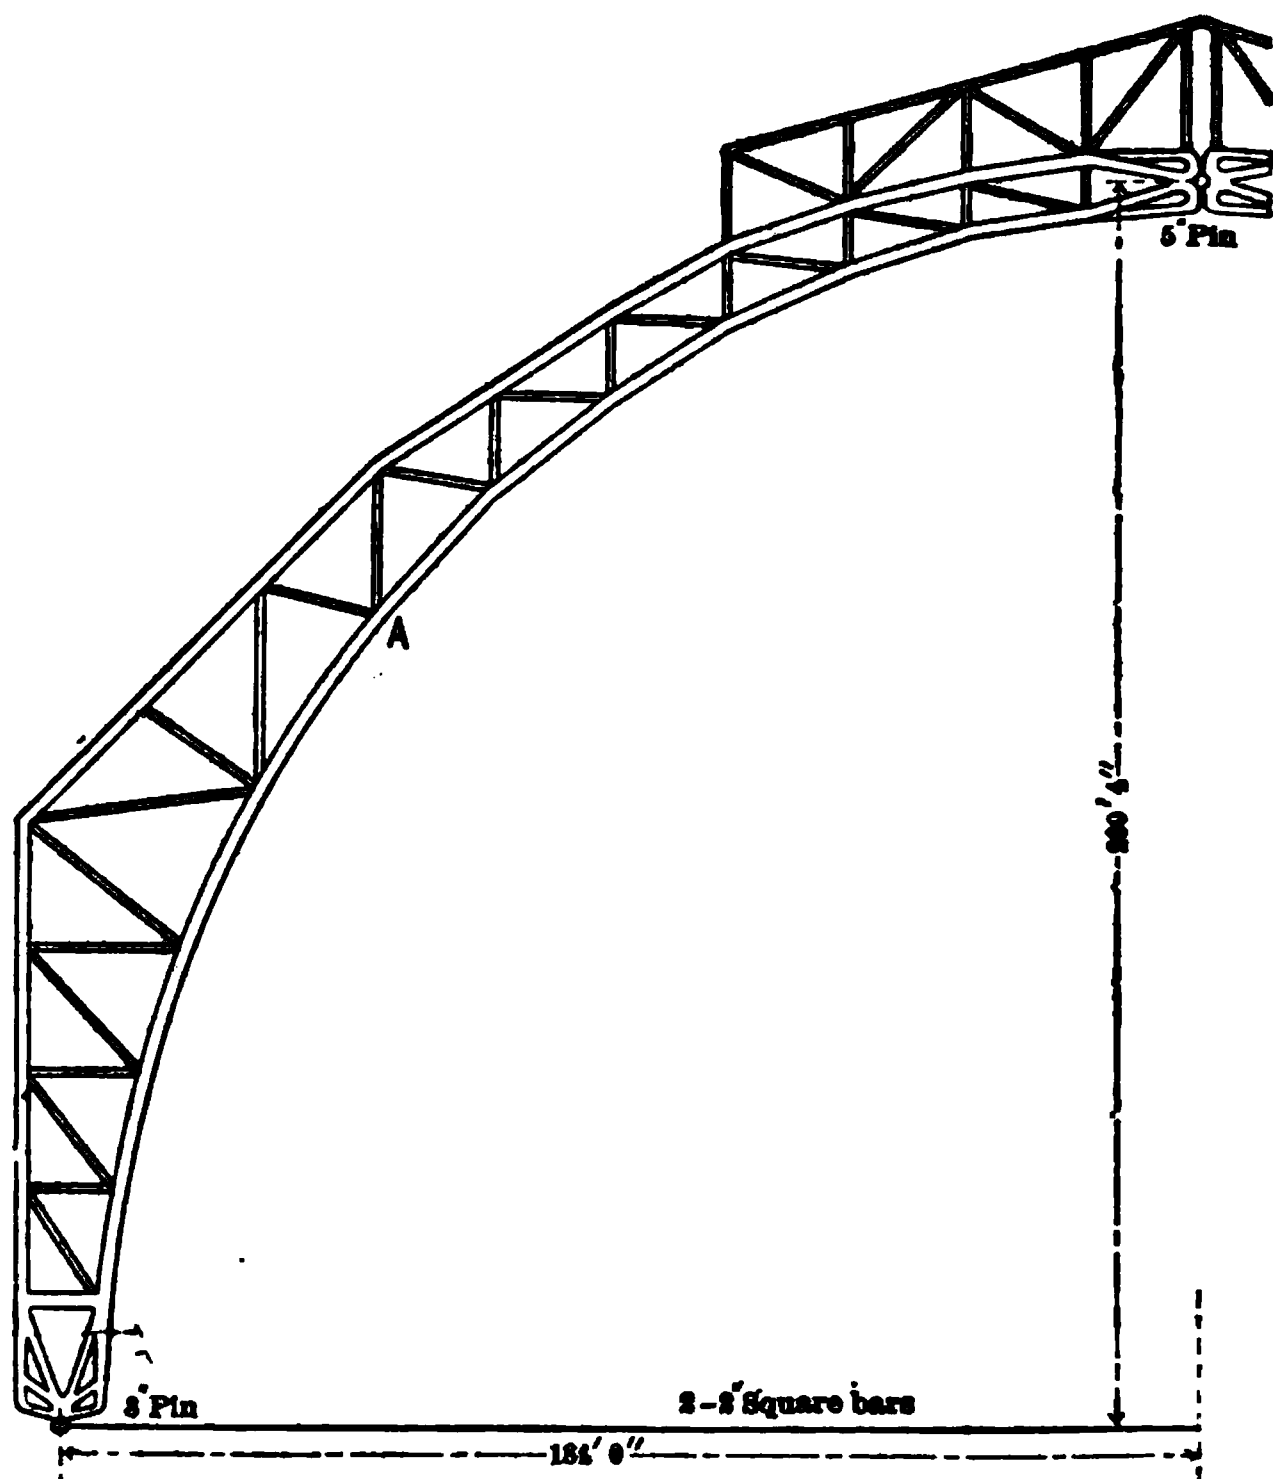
Half Truss. Three-hinged Arch. Manufactures and Liberal Arts Building Chicago Exposition
